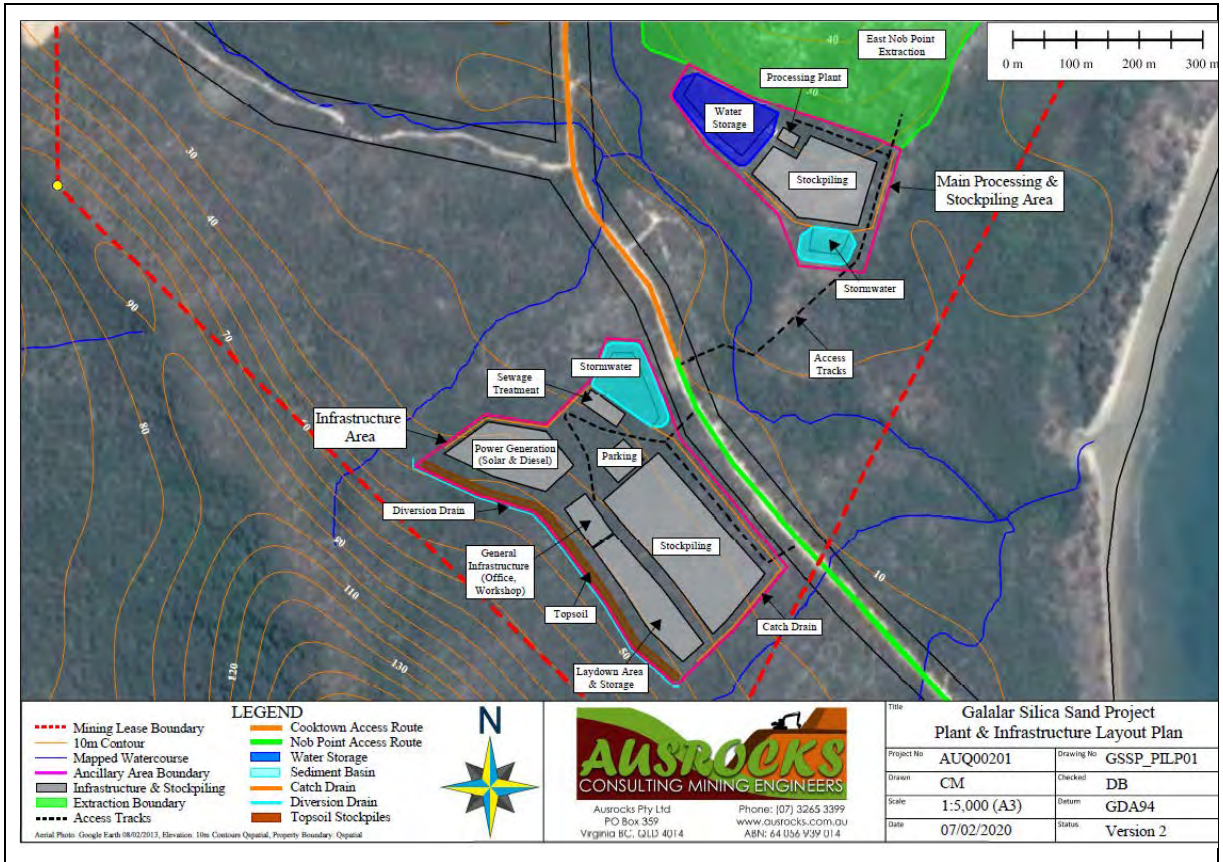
Layout of mining ML – detail of ancillary infrastructure.
